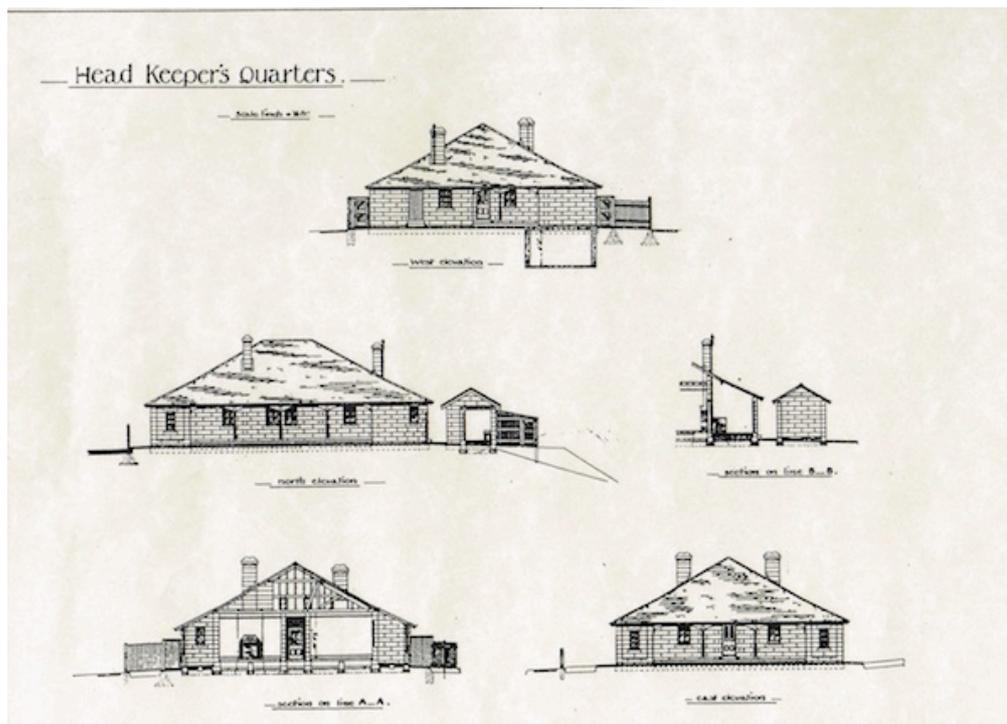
Side Elevations of the Main Lighthouse Keeper's Cottage at Cape Byron. (National Archives)
